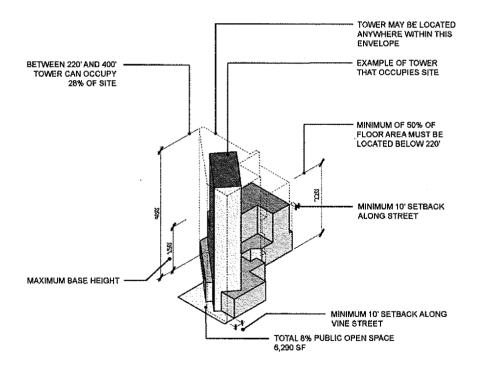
b.1: East Site - 400 Feet Maximum Tower Height
